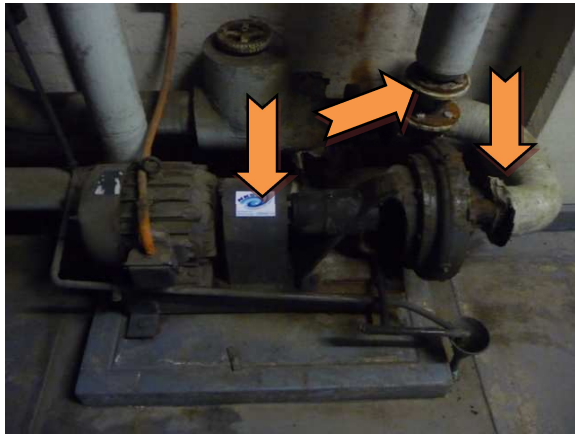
Main Building basement – Plant Area 2 – assumed asbestos millboard lining, bituminous board and HRC fuses
